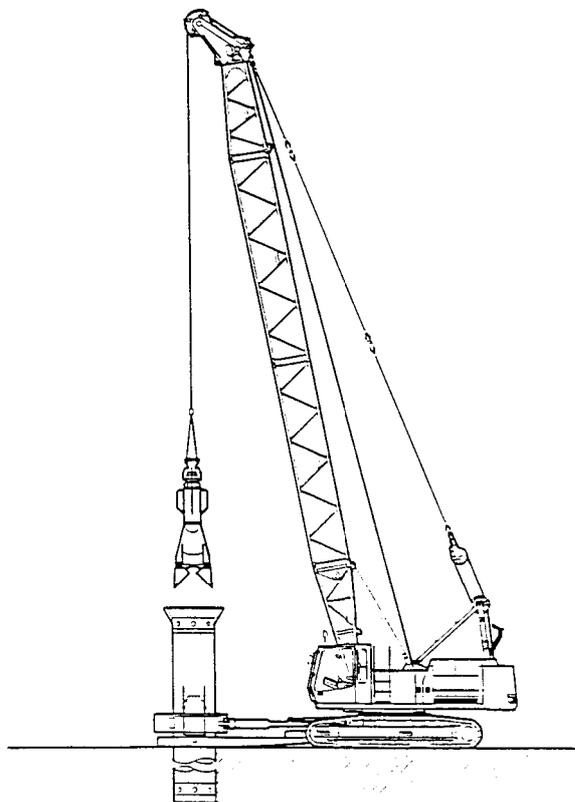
Crawler type excavator with hole drilling equipment (casing oscillator)
